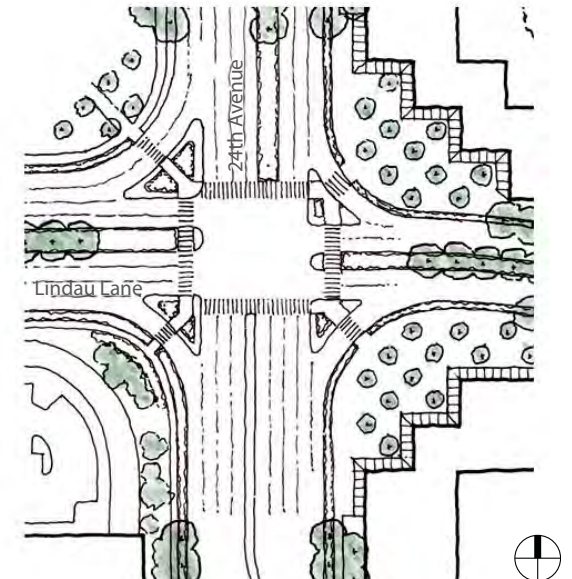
Lindau Link Gateway: Orthogonal plaza concept
